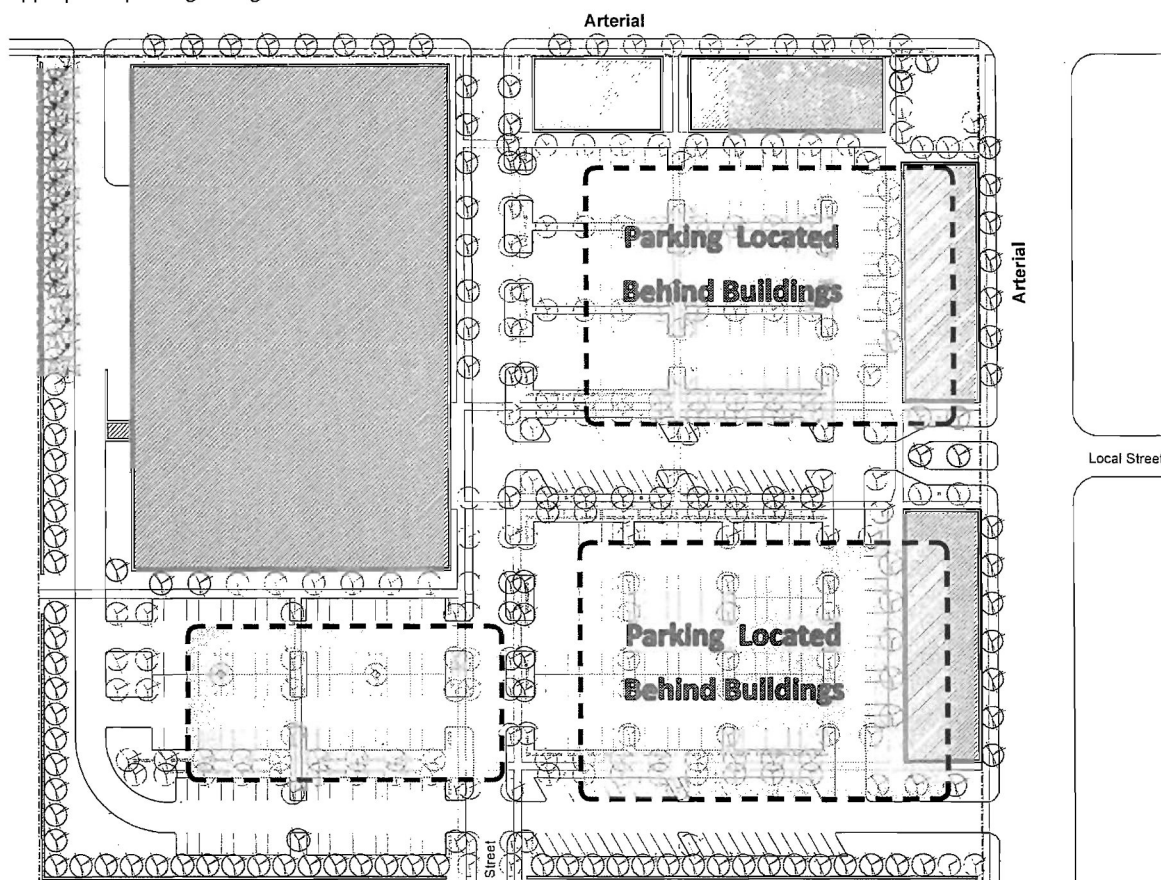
C.2: Parking set back from the street and buffered by landscaping.
